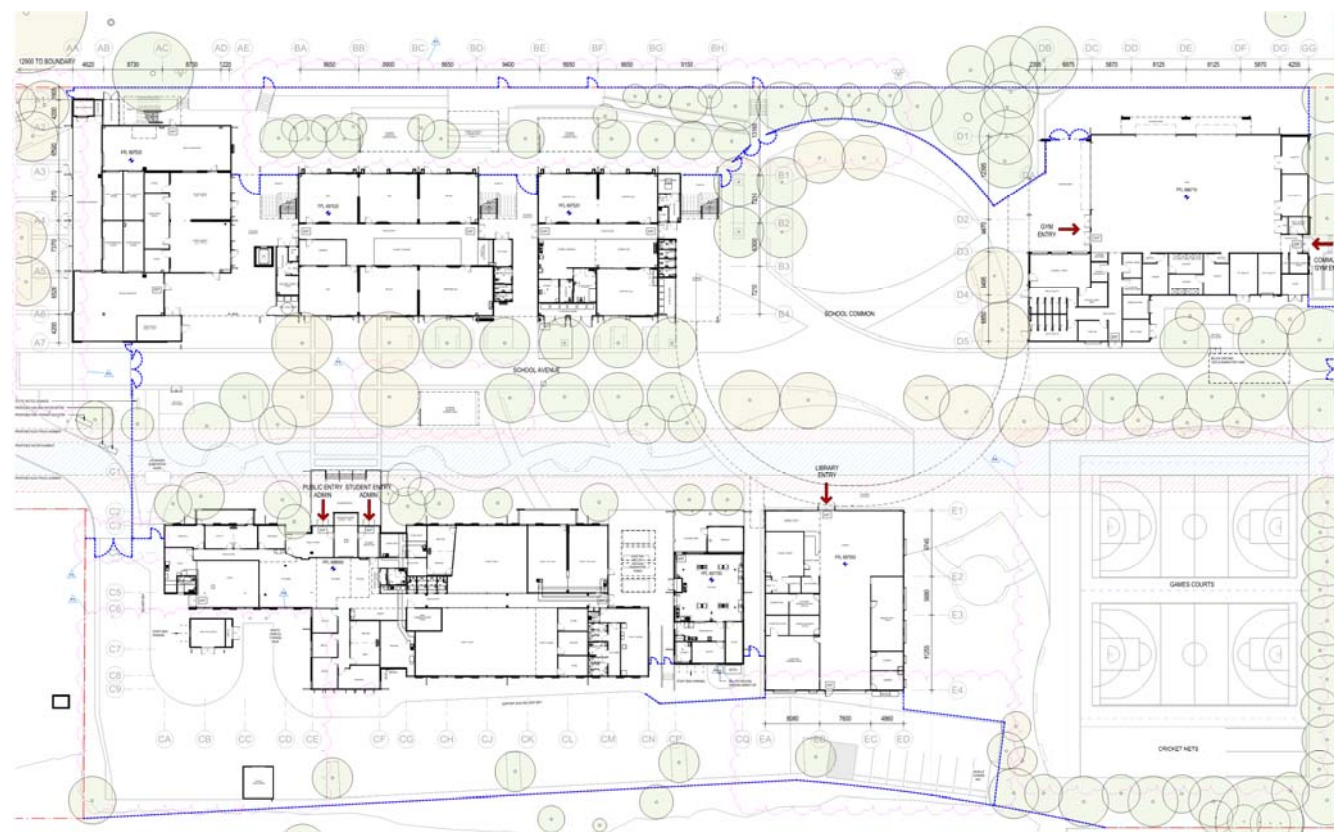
Proposed Architectural Ground Floor Plan for BHS (Source: TKD Architects)
